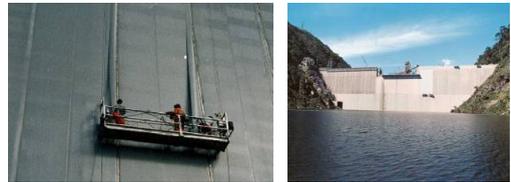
Miel I RCC Dam, Colombia 2002. At left, the stainless steel profiles are waterproofed with PVC cover strips. At right, the composite geomembrane already installed in the lower sections allowed impounding the reservoir while RCC placement and waterproofing works were ongoing above.
